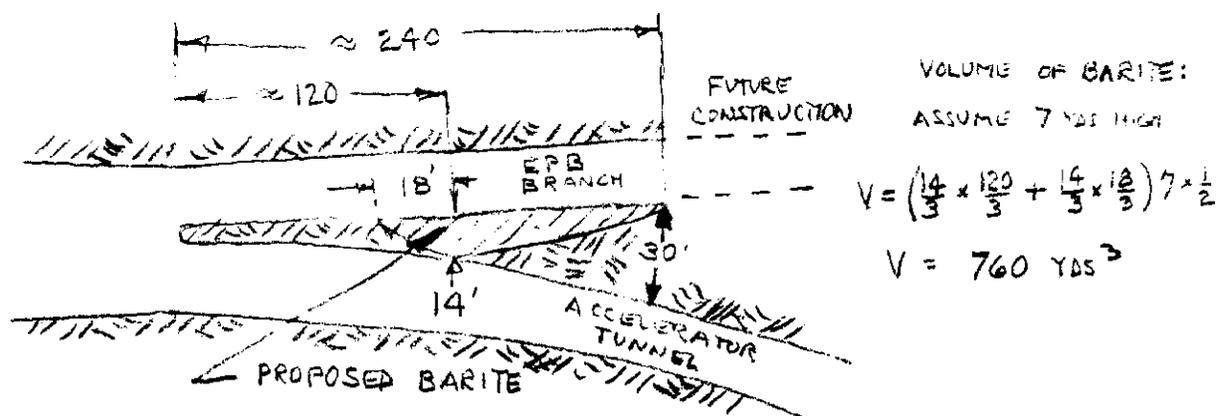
REDUCTION IN BRANCH TUNNEL LENGTH BY USE OF HEAVY AGGREGATE TO SHIELD FUTURE CONSTRUCTION SITE
